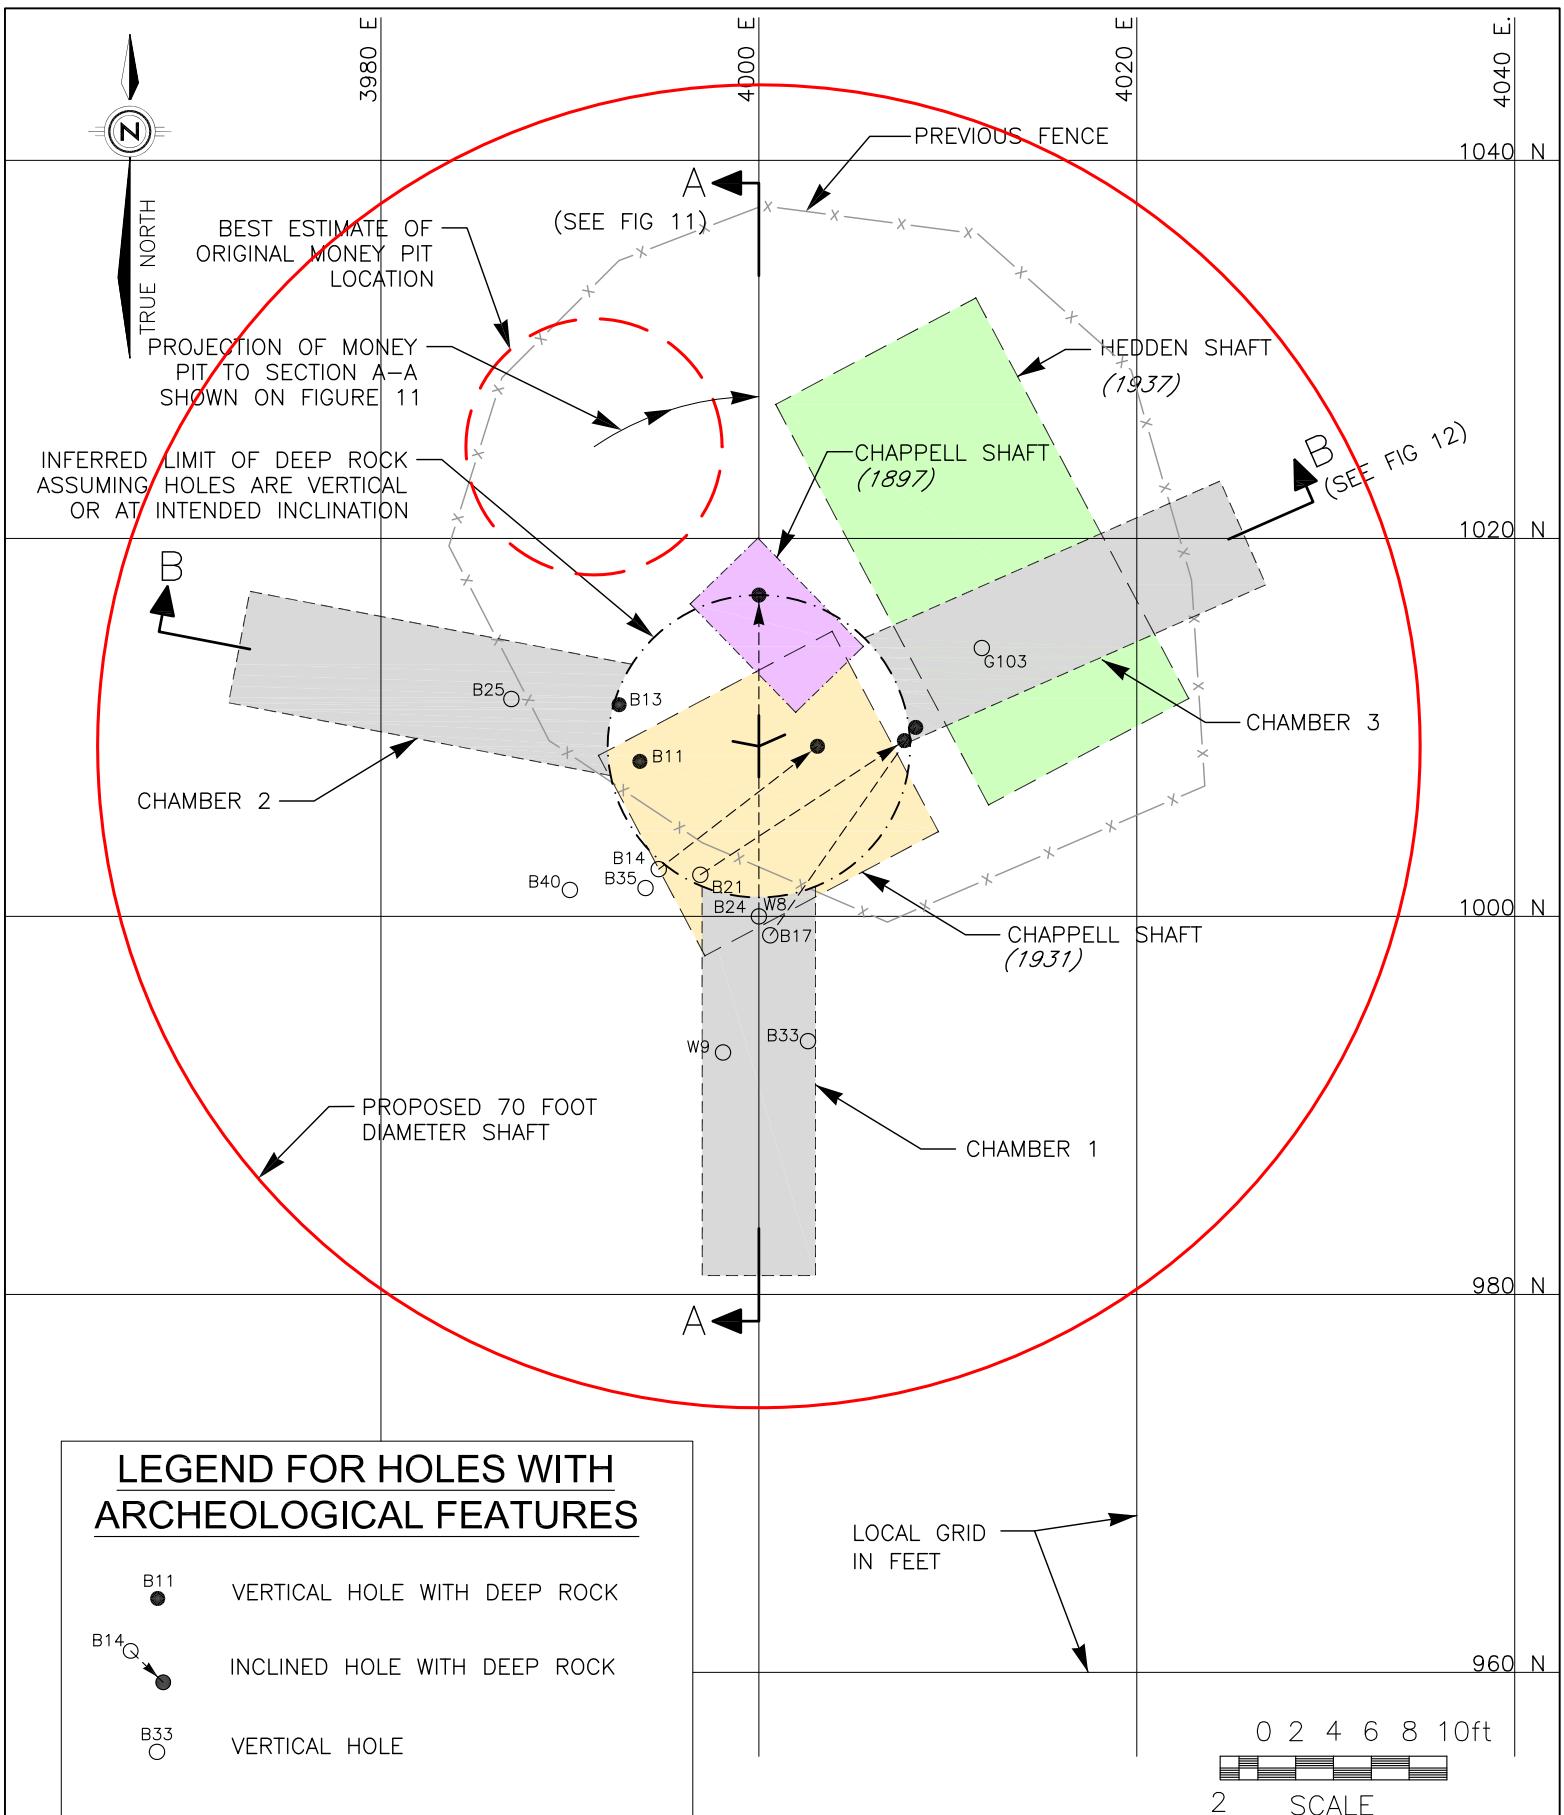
PLAN SHOWING PROPOSED LOCATION OF 70 FOOT DIAMETER SHAFT TO 200 FEET DEPTH
